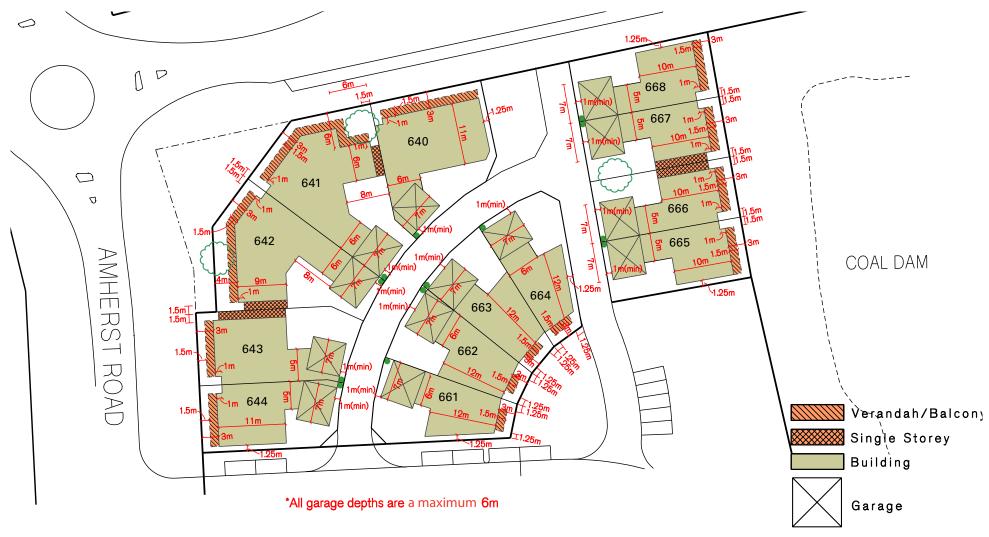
WOODBRIDGE LAKES RESIDENTIAL ESTATE - CARDIFF LANE SITE SPECIFIC PLAN
